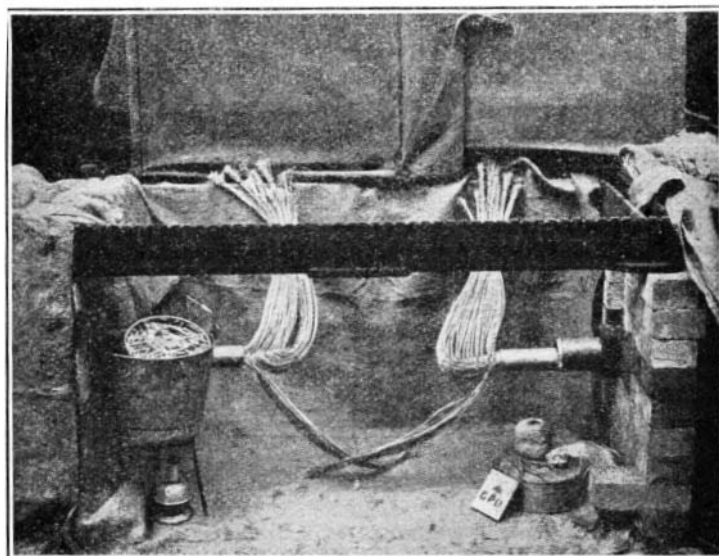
CABLE ENDS CUT IN READINESS FOR JOINTING.
